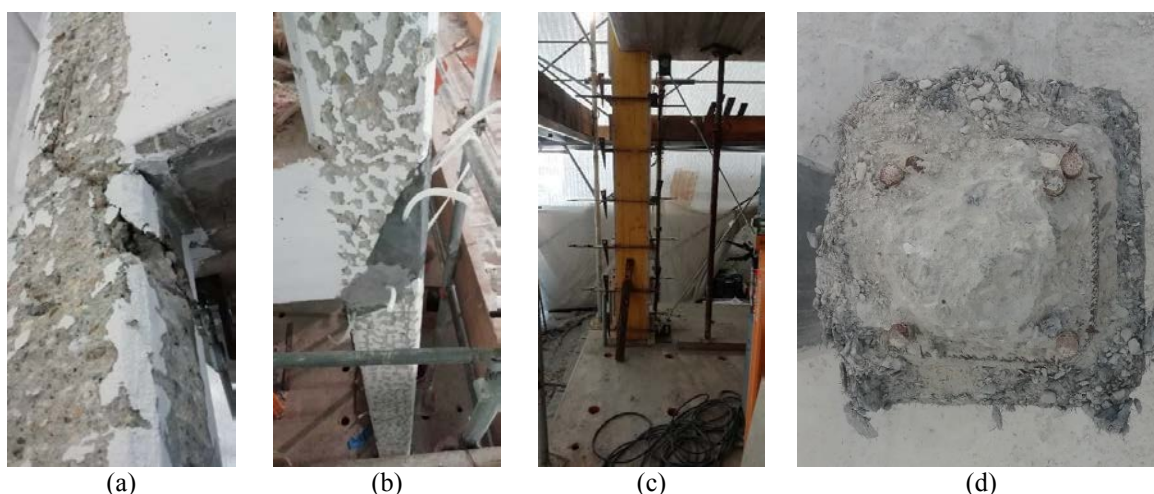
Interventions on RC frame: (a) first-story beam-column joint of the East building at the end of the previous experimental campaign; (b) joint repairing; (c) column strengthening; (d) cross-section of the strengthened column during the demolition at the end of the tests.
